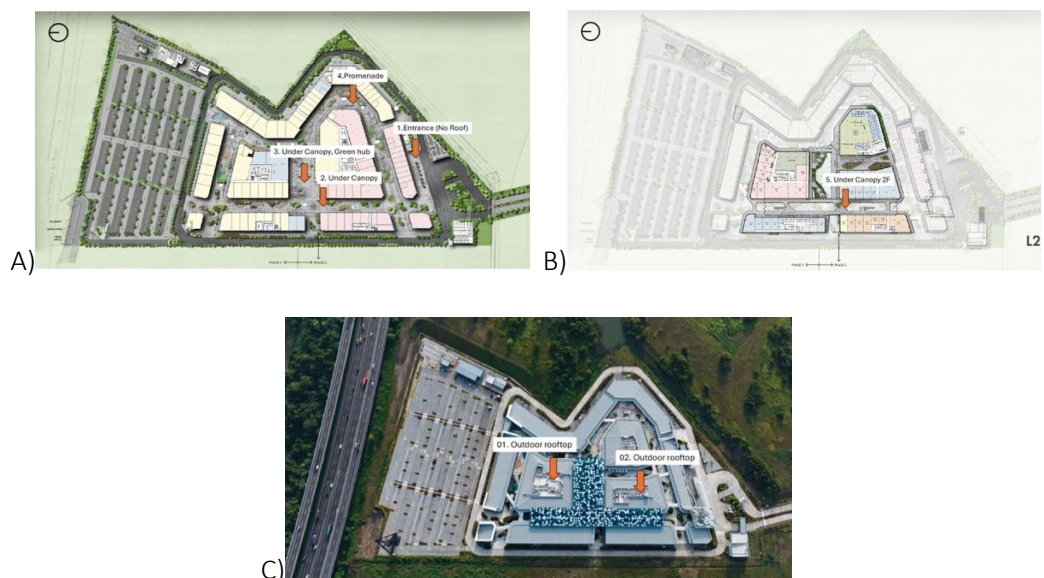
Spatial distribution of rooftop and under-canopy measurement points inside the retail complex. A) First floor. B) Second floor. C) Rooftops for AWS
